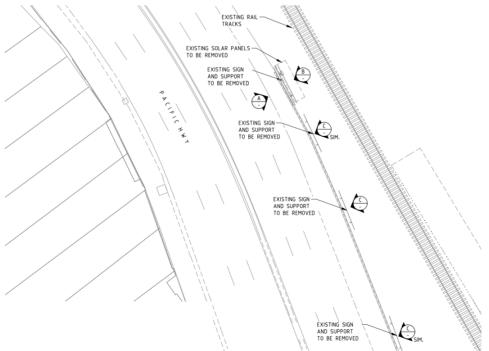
Existing site plan showing four signs to be removed (Source: Dennis Bunt)
